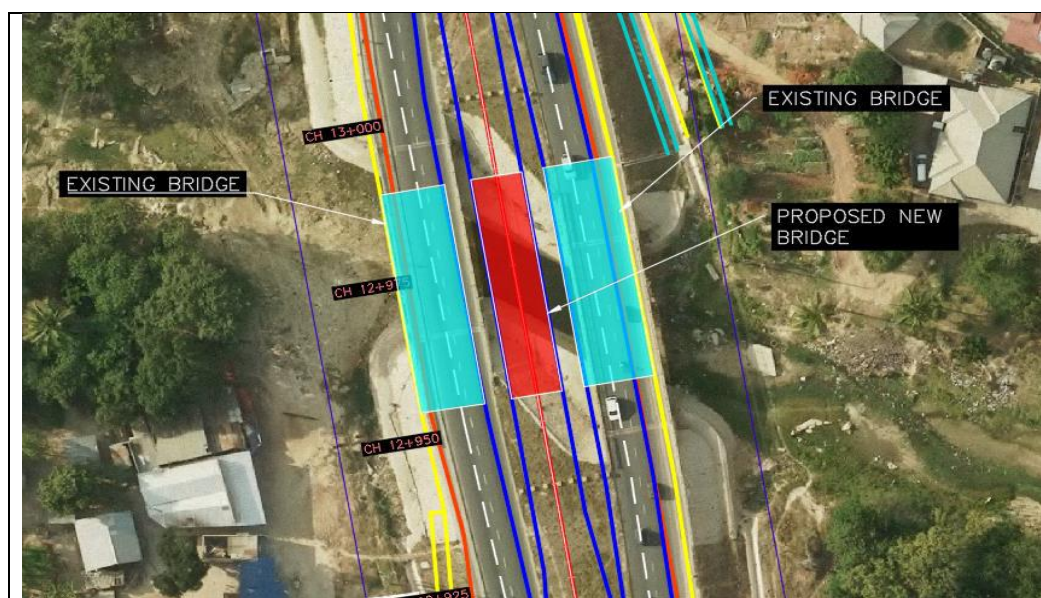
New bridge and Existing Bridge at km 12+975.
